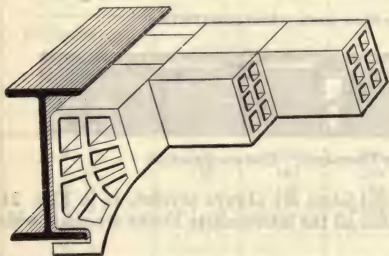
Raised Side-construction Skew for End-construction Tile Floor-arch
